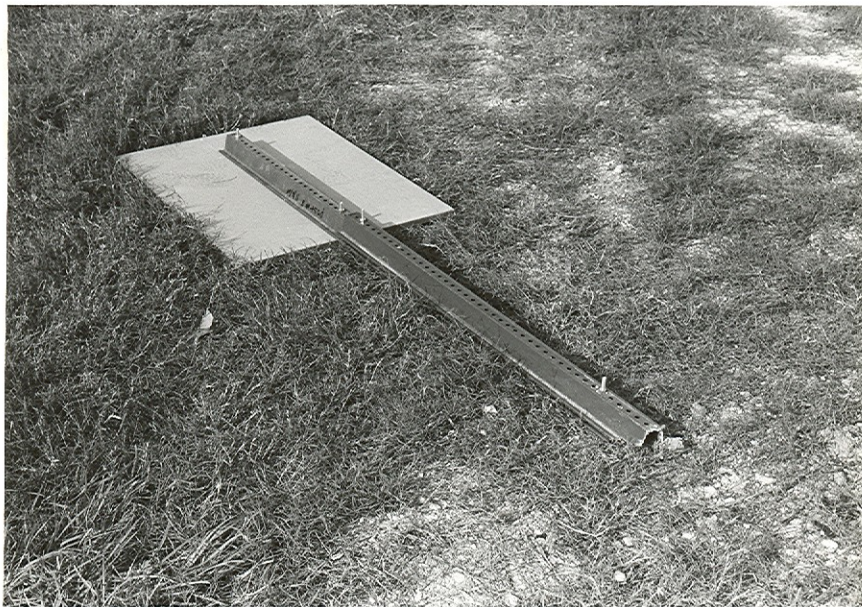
SIGN INSTALLATION AFTER TEST 8.
